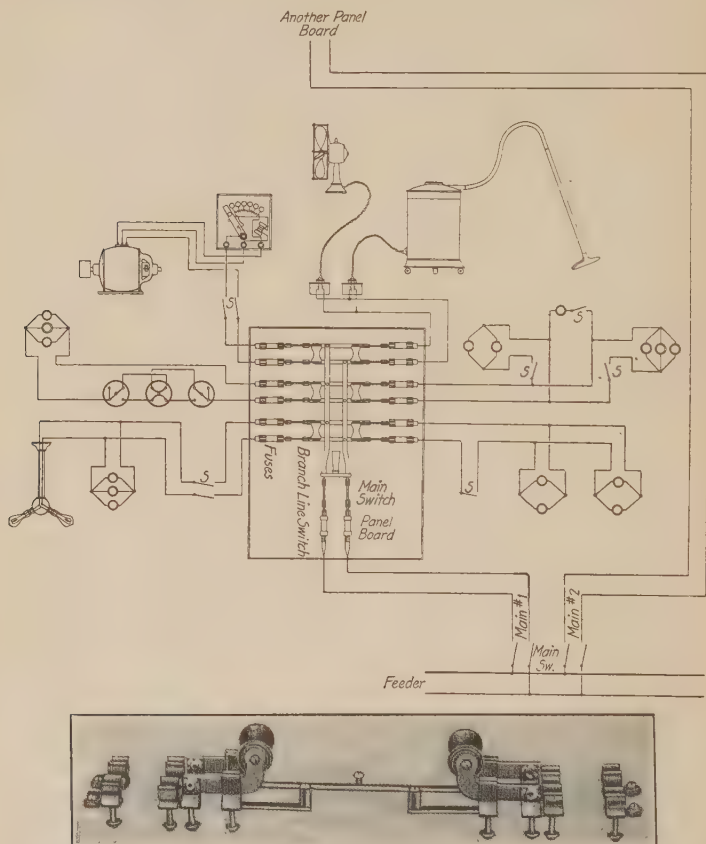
Lower part figure shows construction and arrangement of the switches and fuse holders on the board.
